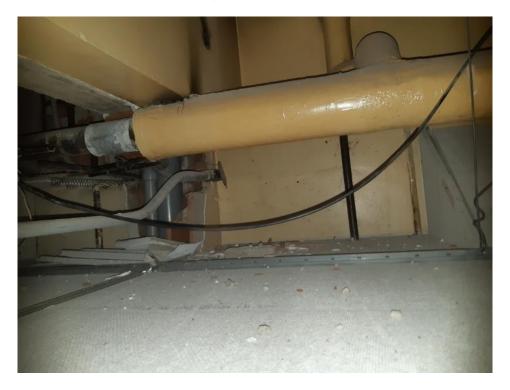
Basement, lab 101, above second window from east along south wall, 2 square metres debris on ceiling tile.
